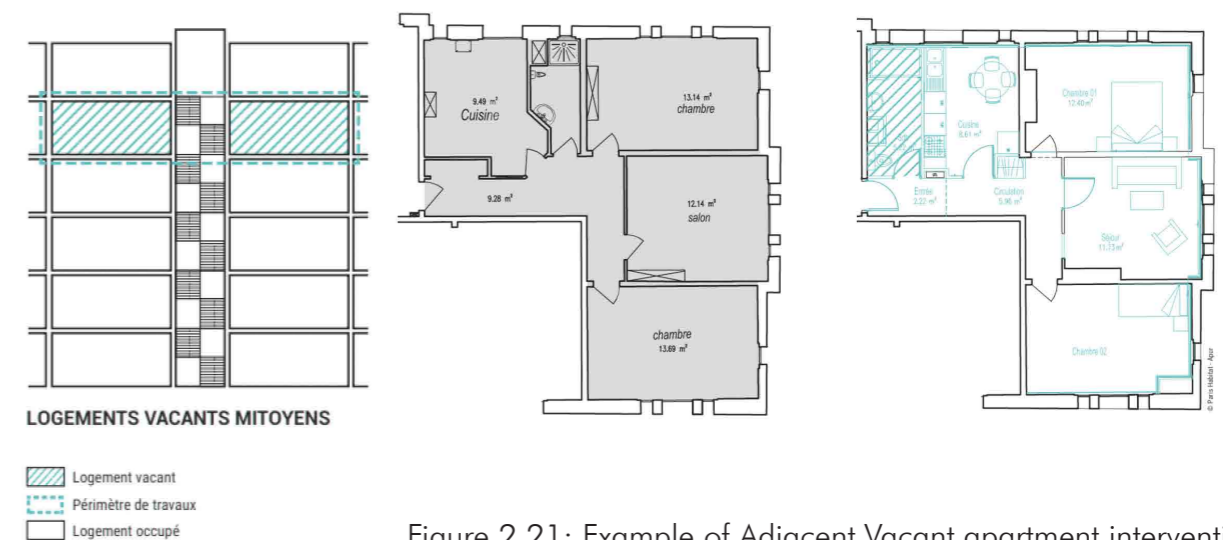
Example of Adjacent Vacant apartment intervention (Arup,2019)
